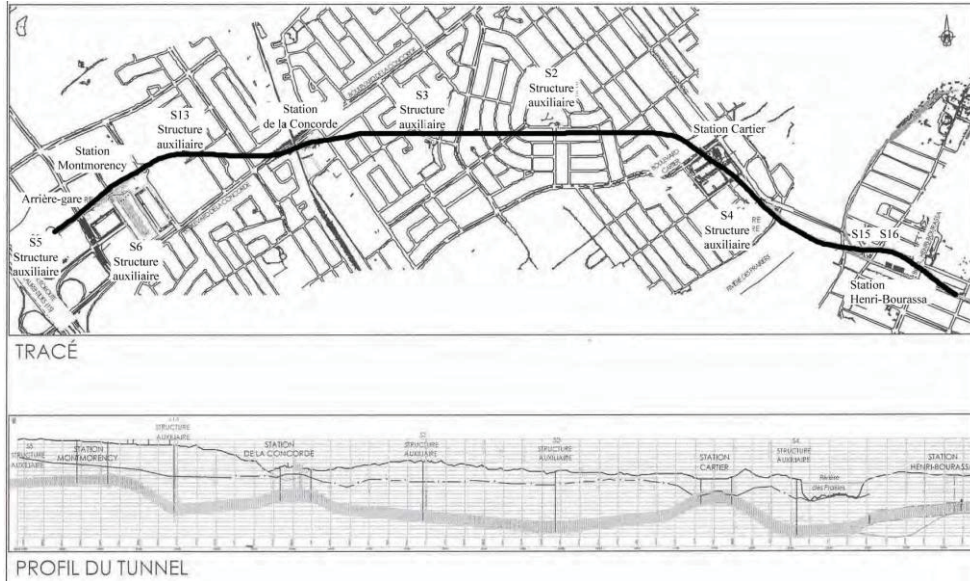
Laval tunnel metro extension profile (SNC-Lavalin, 2010)
